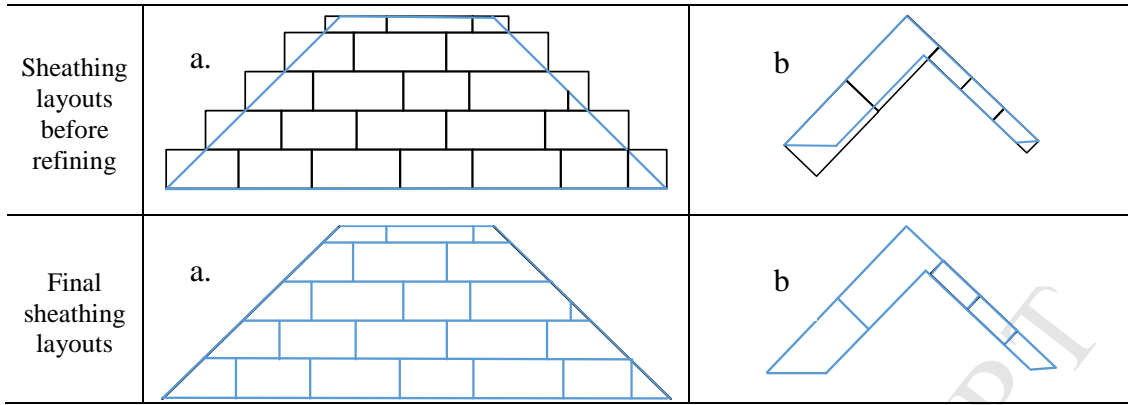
Sheathing layout design examples (top down view): a. trapezoid; b. irregular
